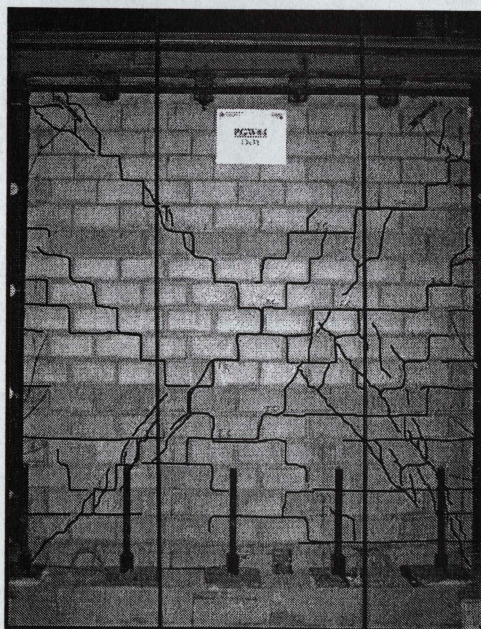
Widening of joint cracks and rupture of horizontal reinforcement of Wall 2
